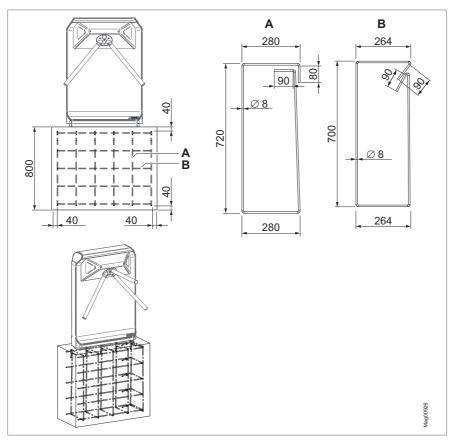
Reinforcement plan FMTP-ML (dimensions in mm)
